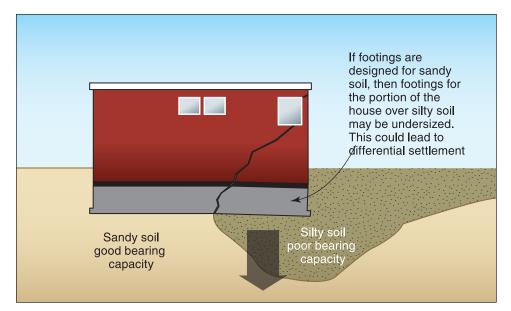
Significant differential settlement in the foundation causing slab failure
